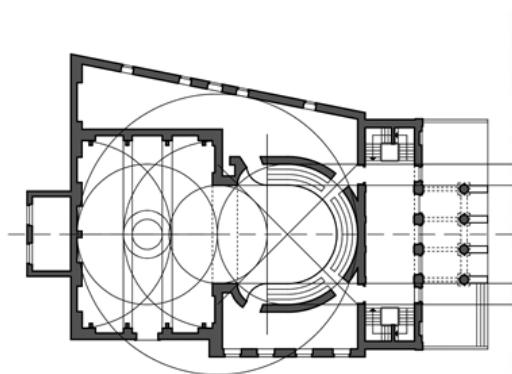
Teatro das Laranjeiras, ground floor plan with regulatory layout. Author's reconstruction.
